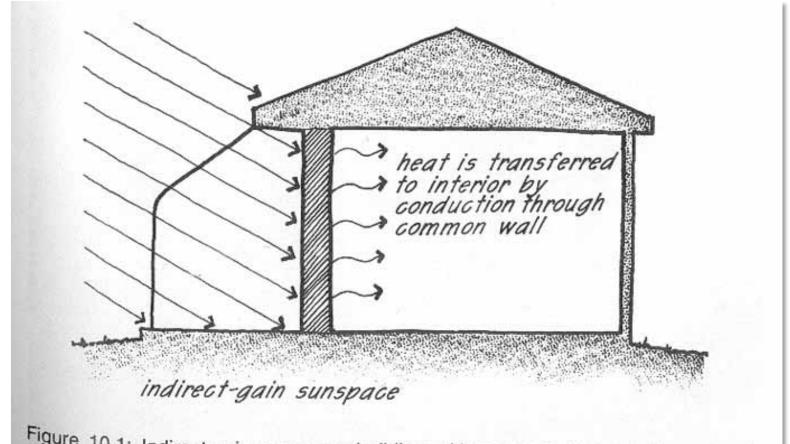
Indirect-gain sunspace building with common thermal storage wall. Conduction through the common wall is the primary means of heat transfer to living space.
